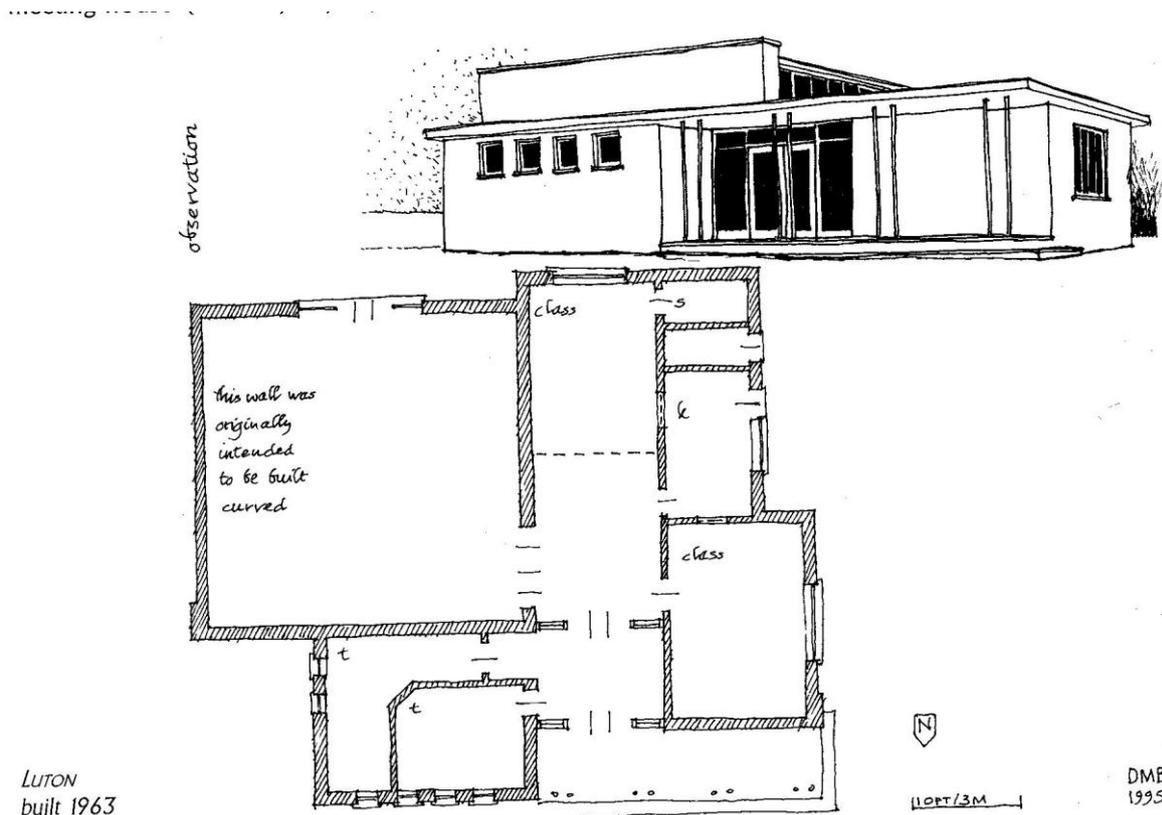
The ground plan of the meeting house and a perspective view, from *Butler*, vol.1, p.6
